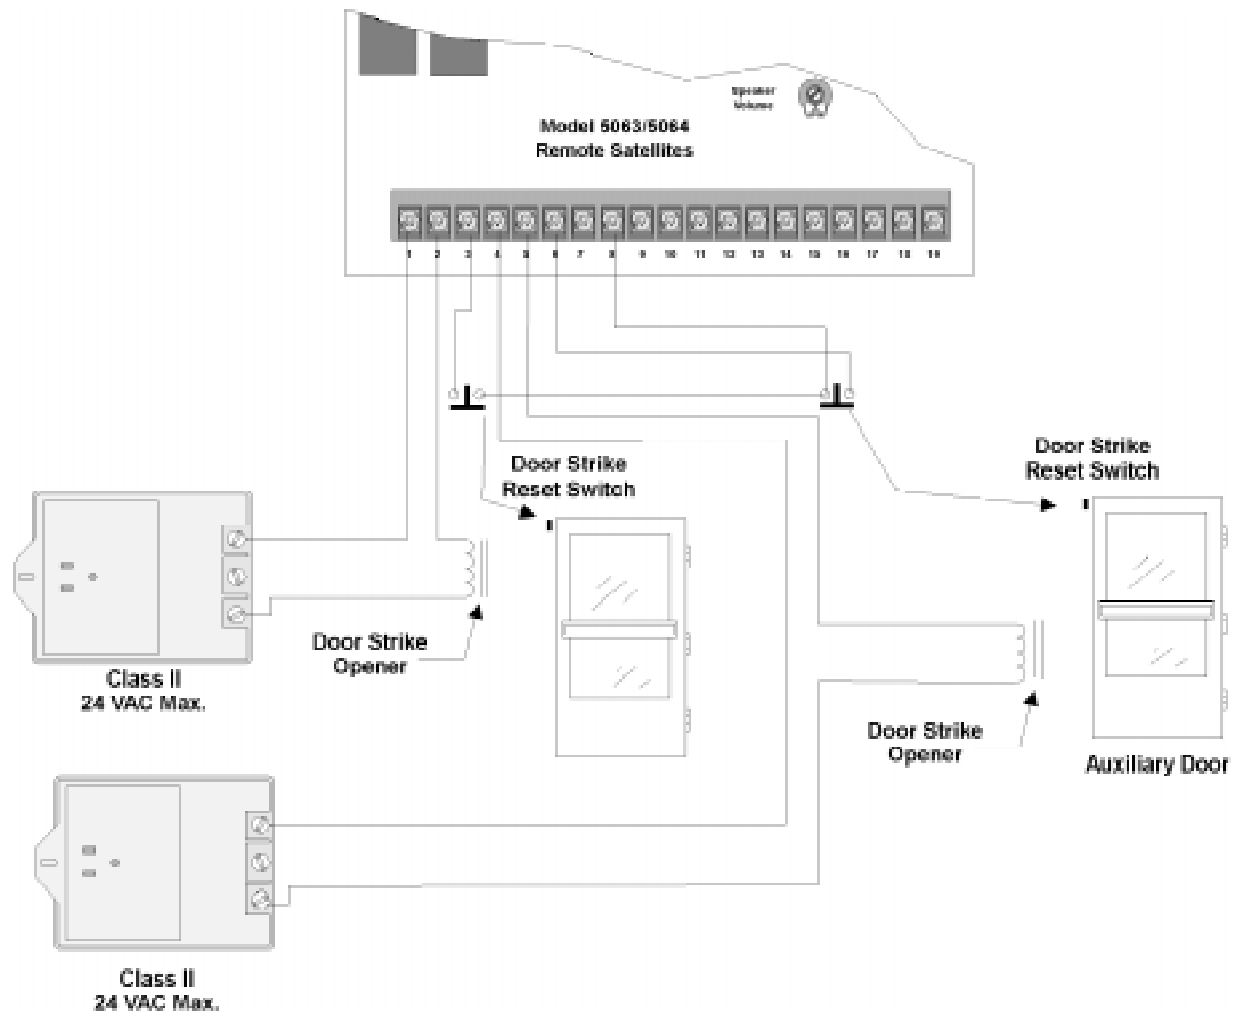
AC Doorstrike to 5063/5064 Wiring Diagram
